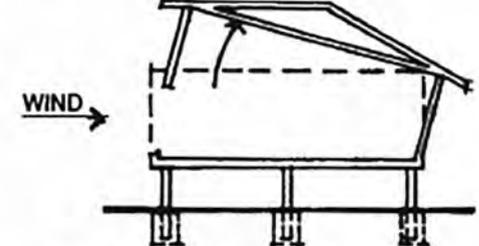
FAILURE OF FLOOR JOIST TO WALL AND BEARER CONNECTIONS
